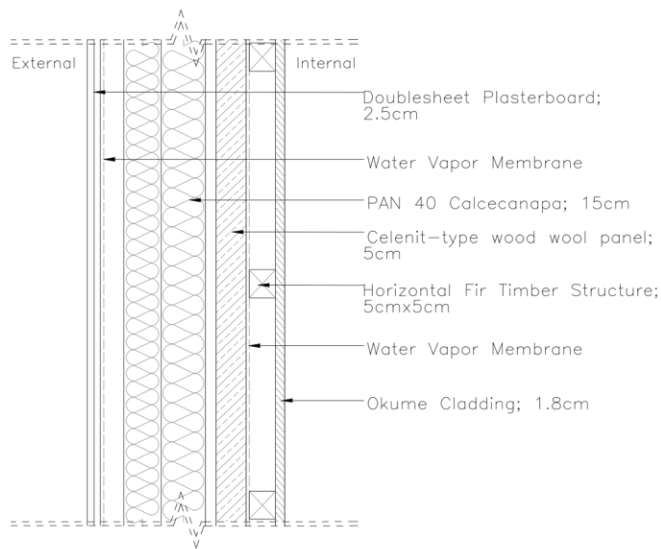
Bricolla Timber Dry-Wall. Reference: Author.
